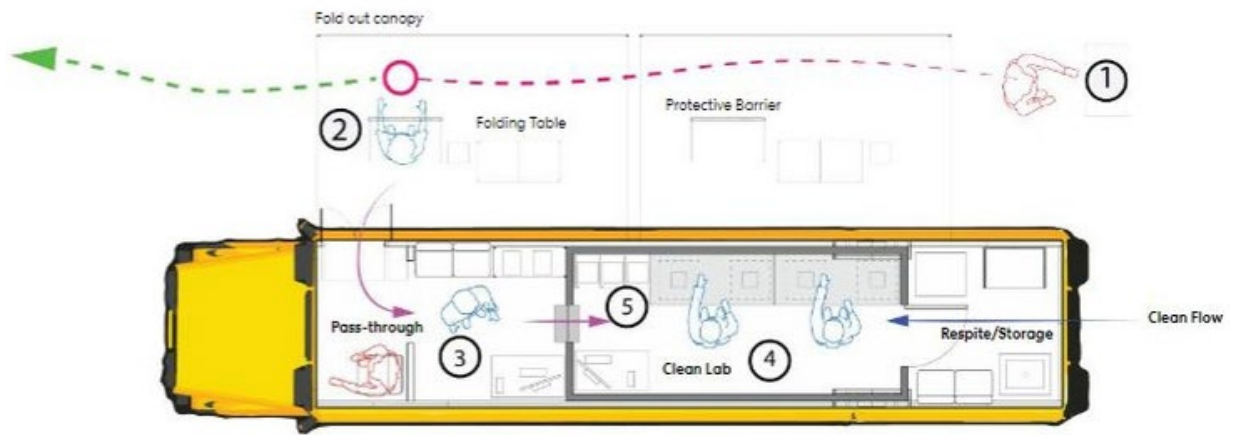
School Bus SURGE Conversion – Perkins and Will interior layout and floorplan
